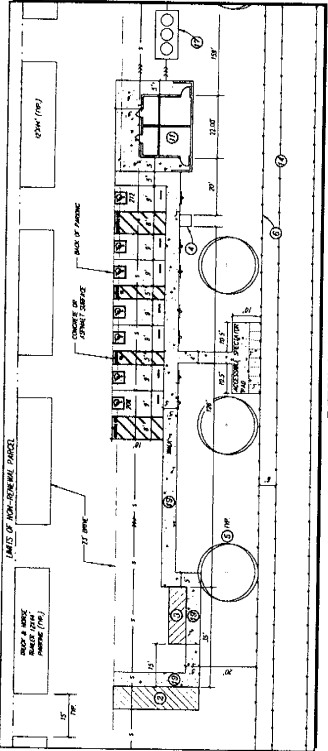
' x 12' TREE WELL PARKING AREA
